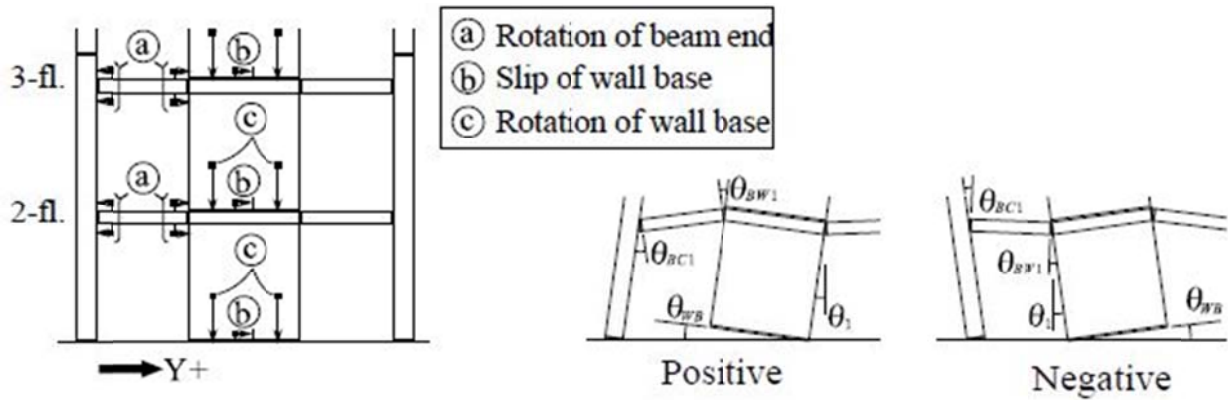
Wall deformations (after Nagae et al. (2011))
